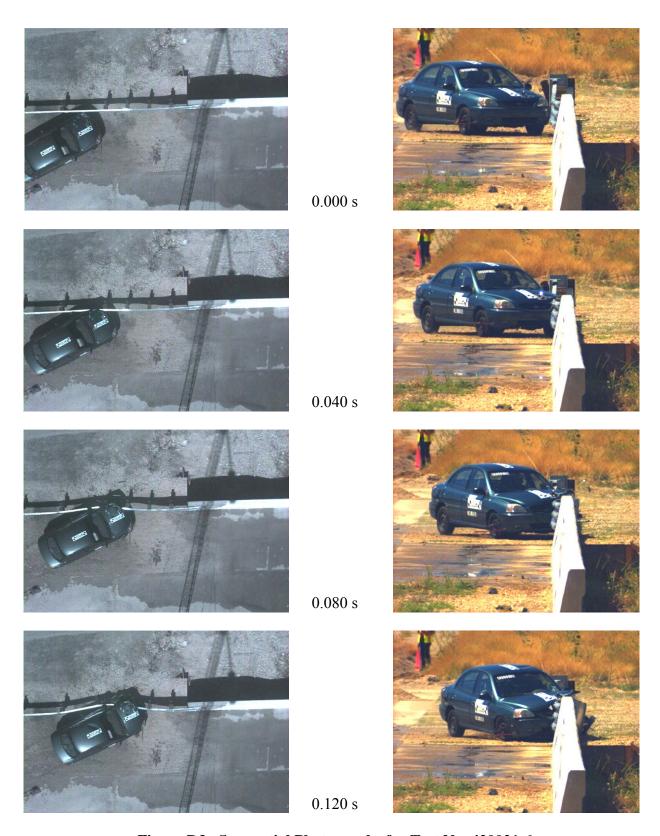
Sequential Photographs for Test No. 420021-6 (Overhead and Frontal Views).
